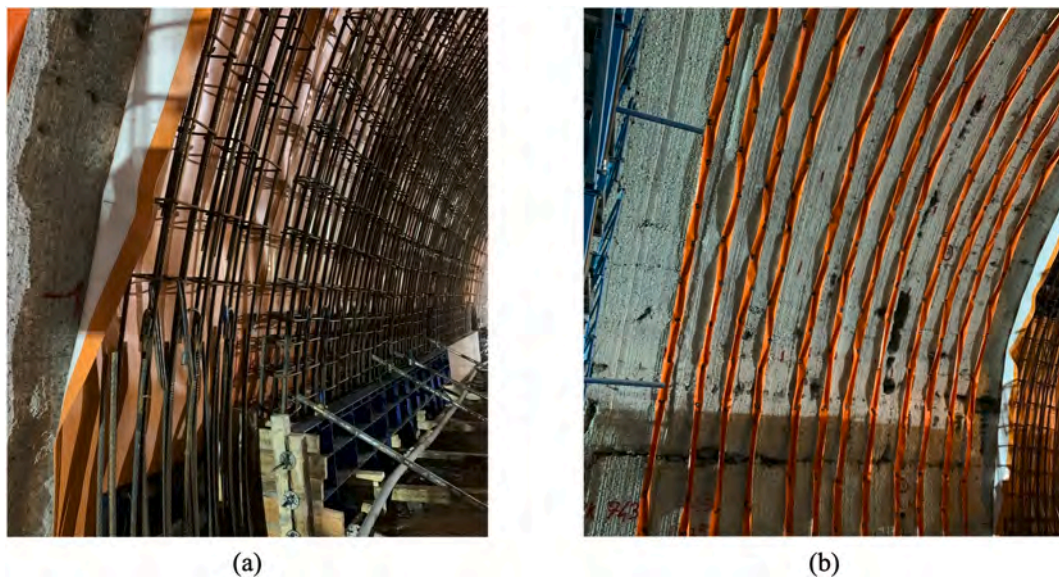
Details of the waterproofing system: view of the a) double-layer structure and b) fixing bands transversally nail-gunned along the tunnel wall.
